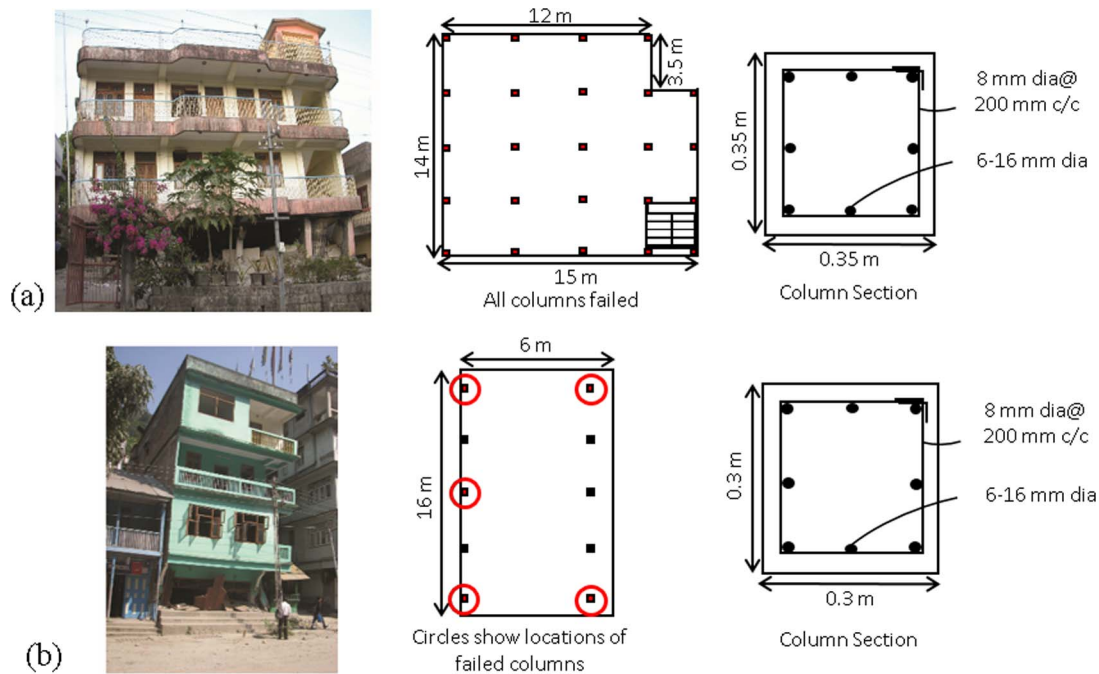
Elevation, column layout and section of collapsed OGS buildings during past earthquakes: (a) a three storey building in Port Blair, India after 26 December 2004 Sumatra earthquake, and (b) a four storey building at Singtam market in Sikkim after 18 September 2011 Sikkim earthquake (Photos by Hemant B. Kaushik).
